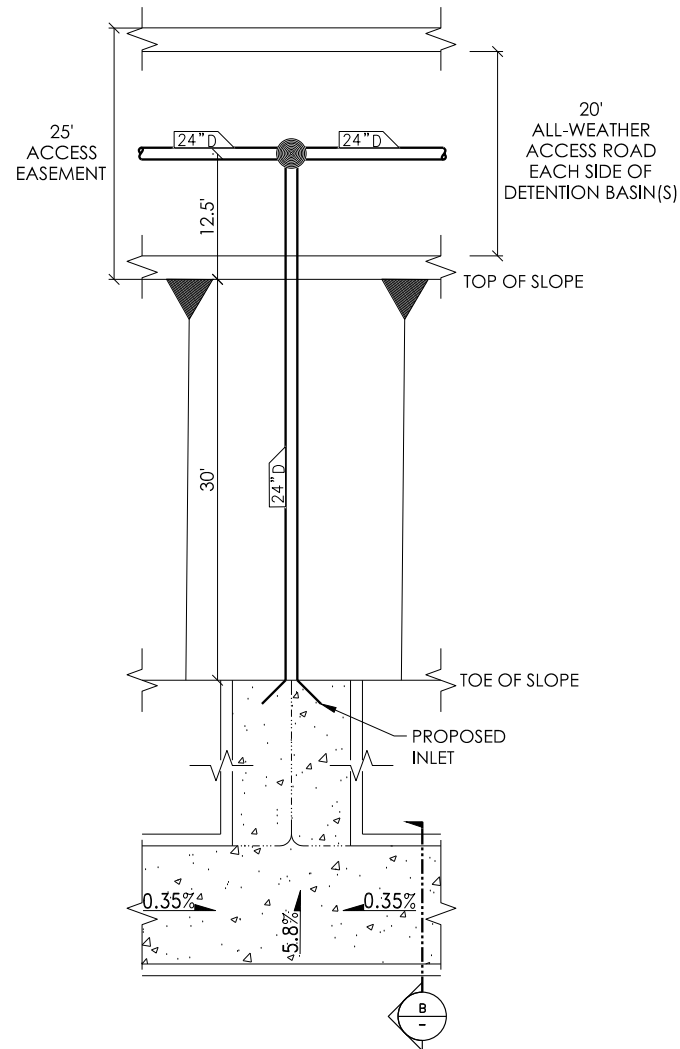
SCHEMATIC BASIN DRAINAGE DETAILS
